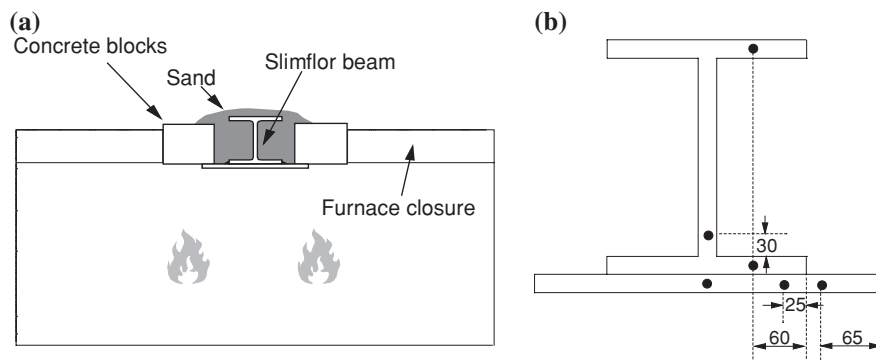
Test at Nullifire Ltd. a Beam cross-section in furnace showing sand; b beam cross-section with positions of thermocouples
